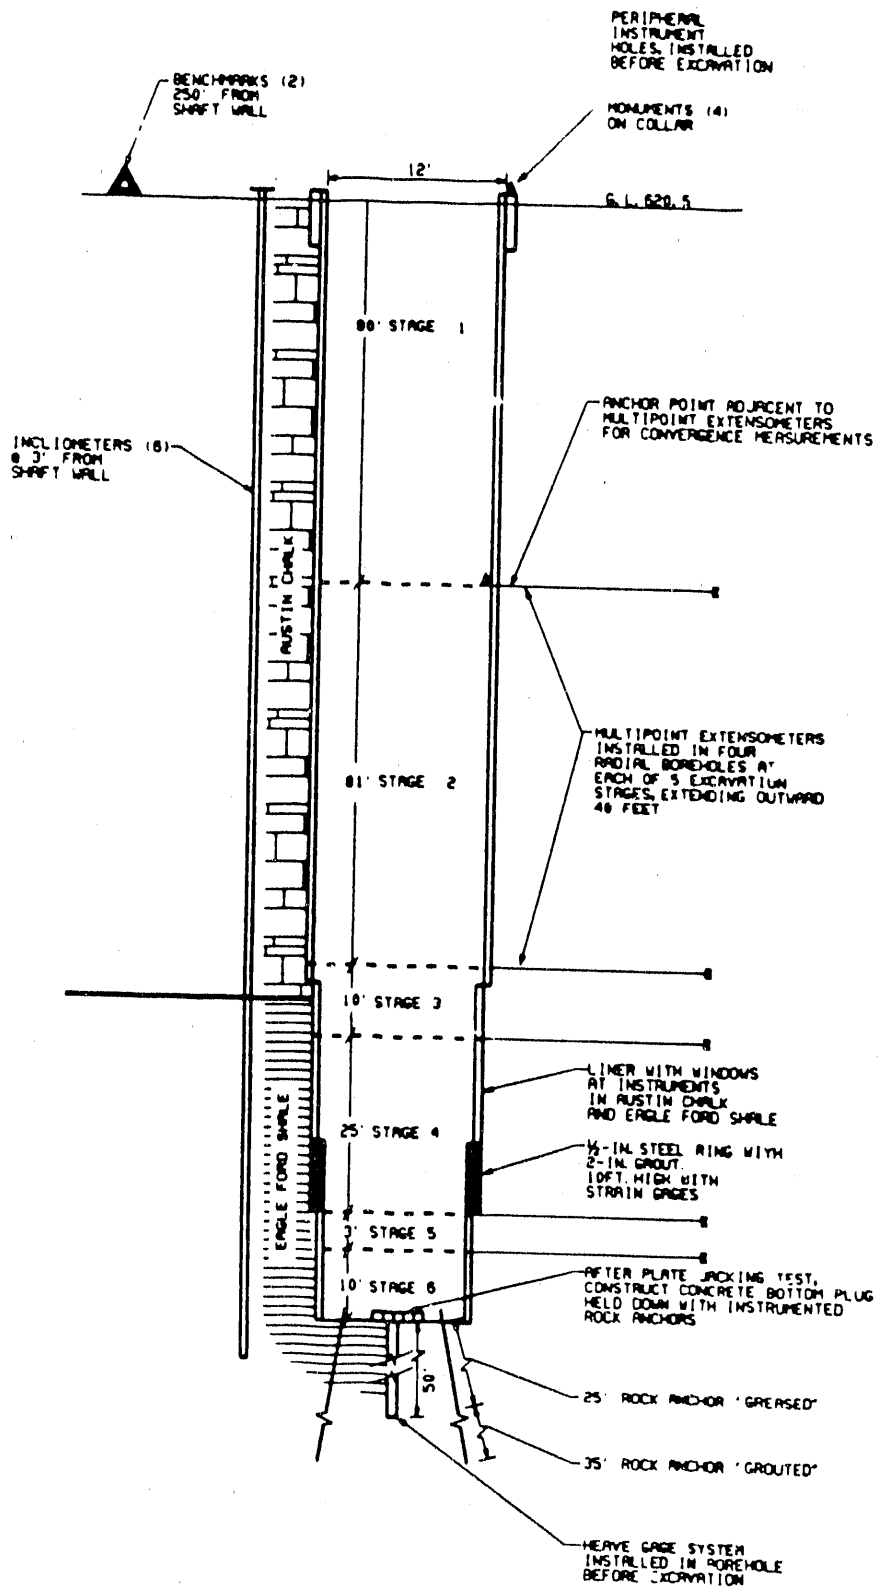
Large Diameter Drilled Hole; Longitudinal Section
